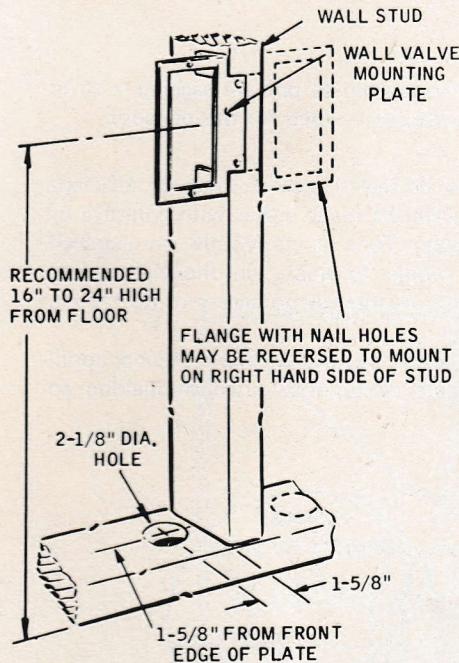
LOCATING VALVE PLATE AND TUBING HOLE
